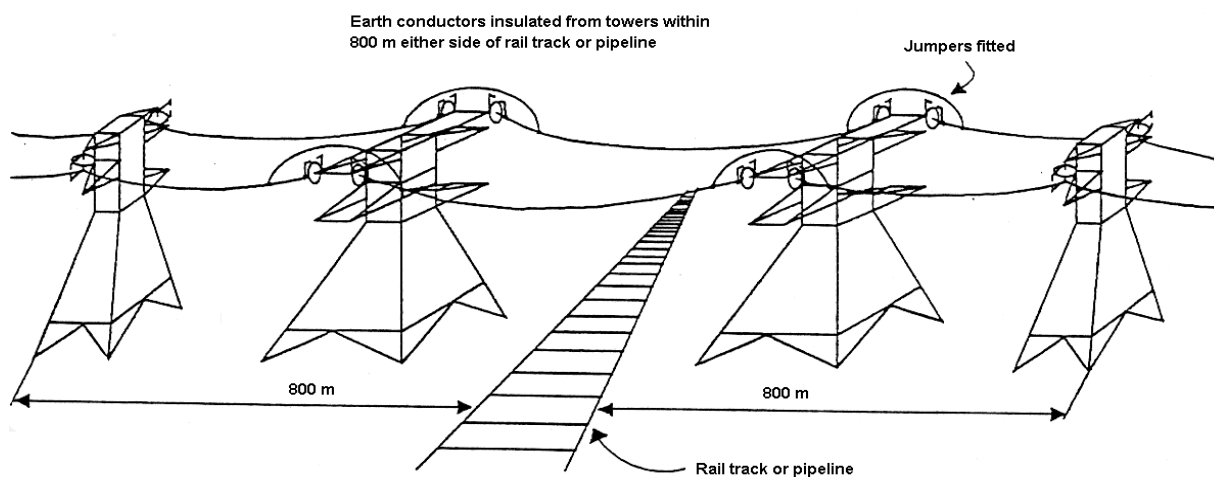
Insulation of earth conductors on suspension and strain towers crossing rail tracks or pipelines
